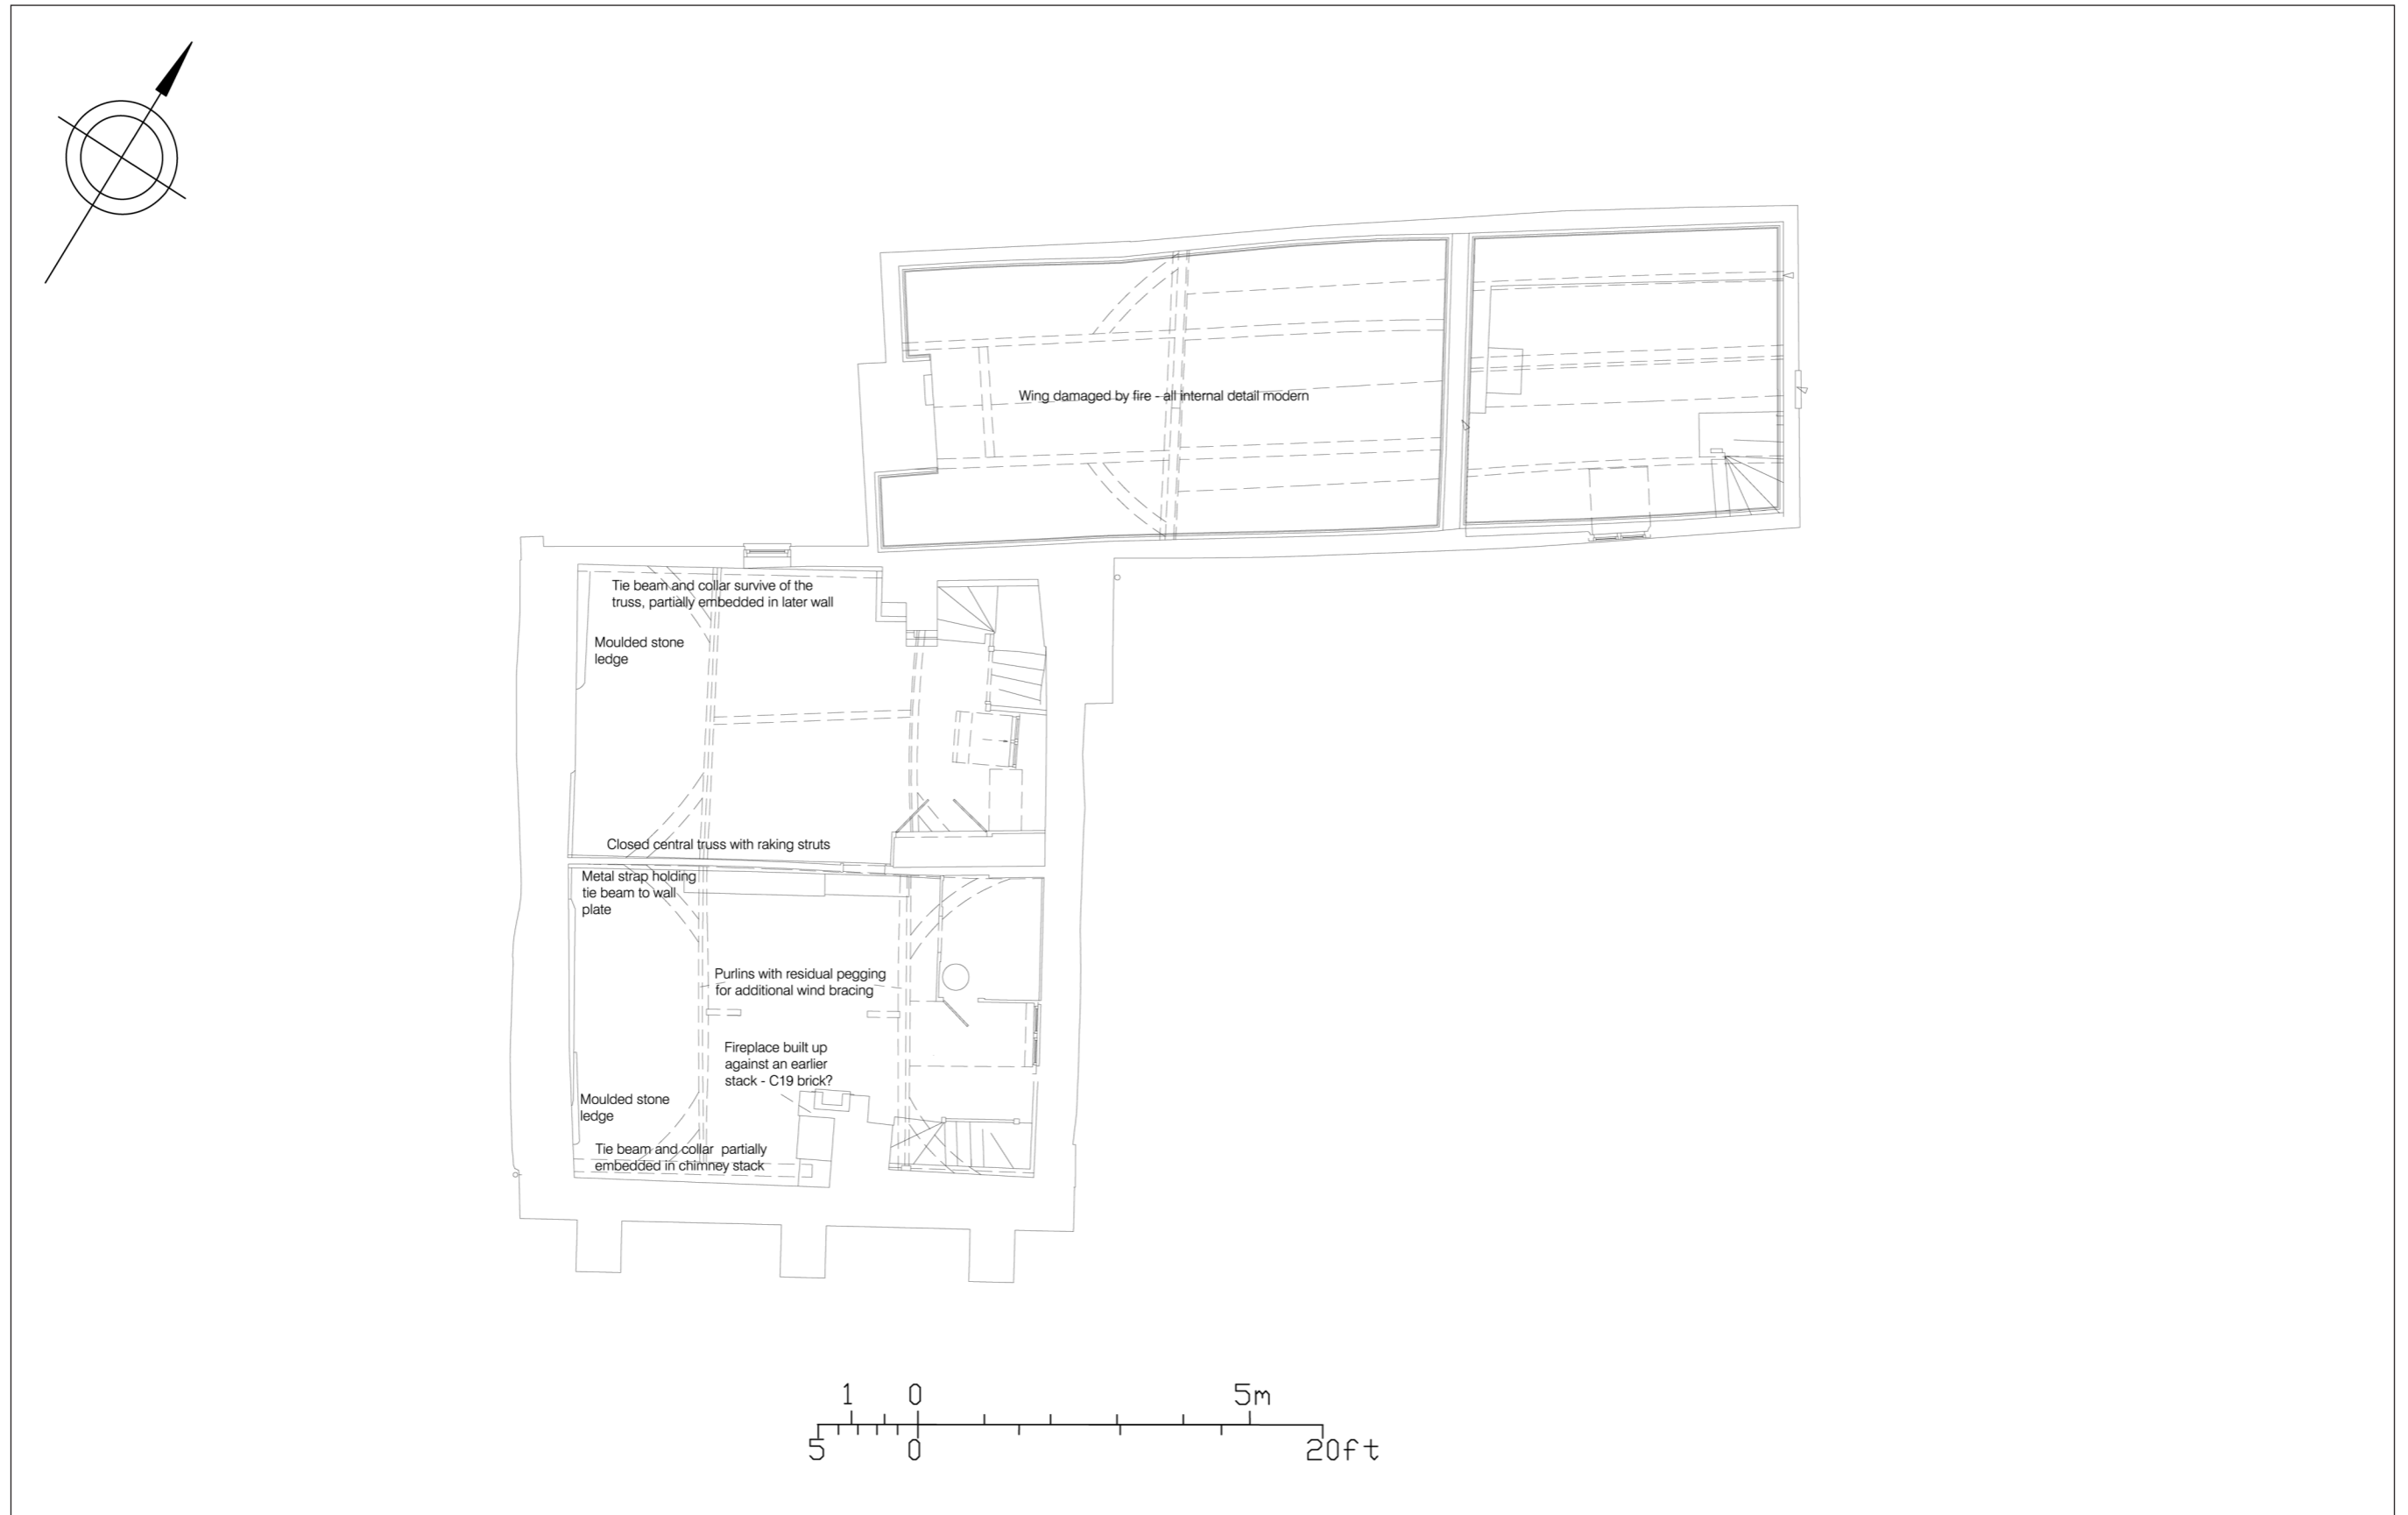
Second-floor plan. Scale 1:100. [Based on survey drawings from Acanthus Clews Architects © Coventry City Council]
